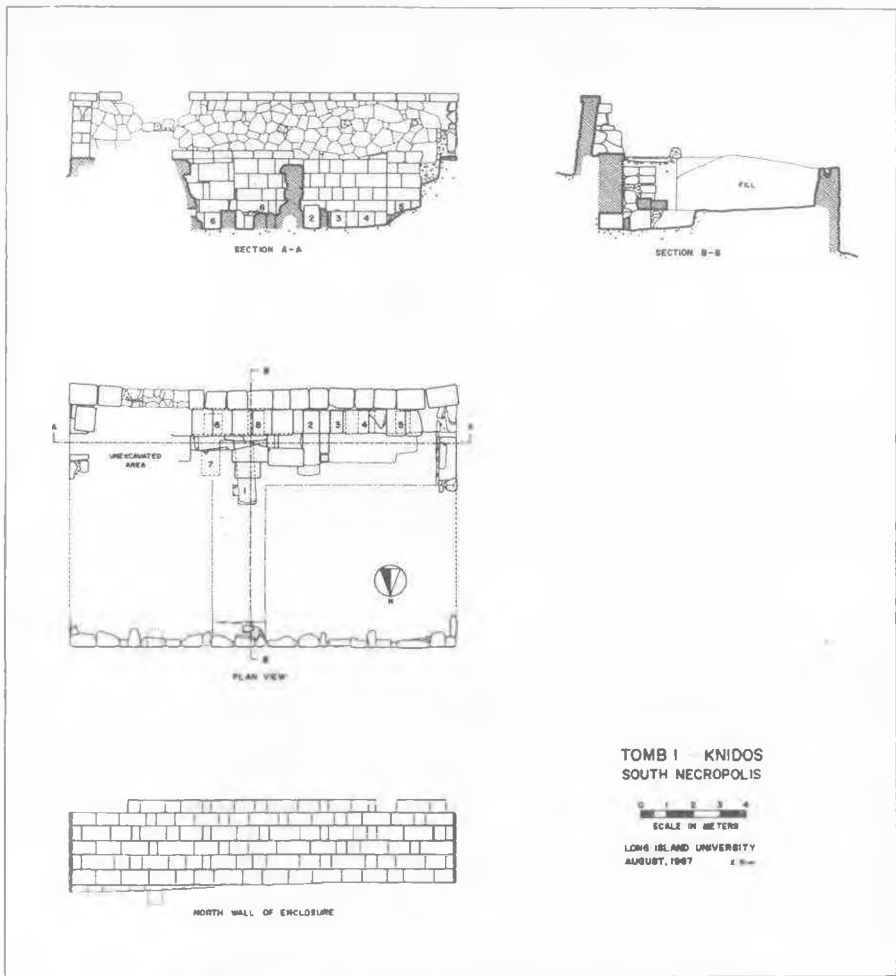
Plan and sections of Tomb 1 in south necropolis.
